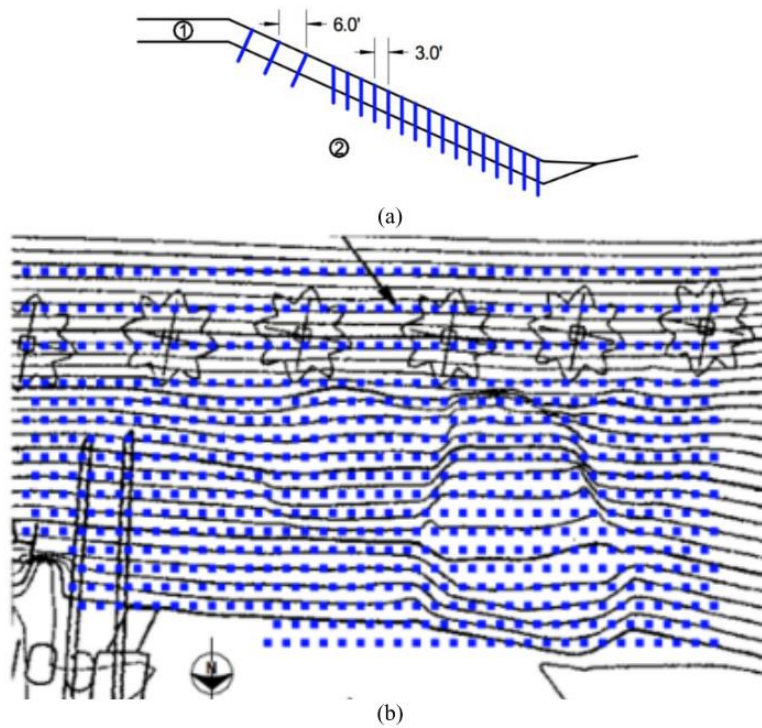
Layout of RPP at the I-435 slope site: (a) Cross-sectional view, and (b) Plan view (Loehr and Bowders, 2007).
